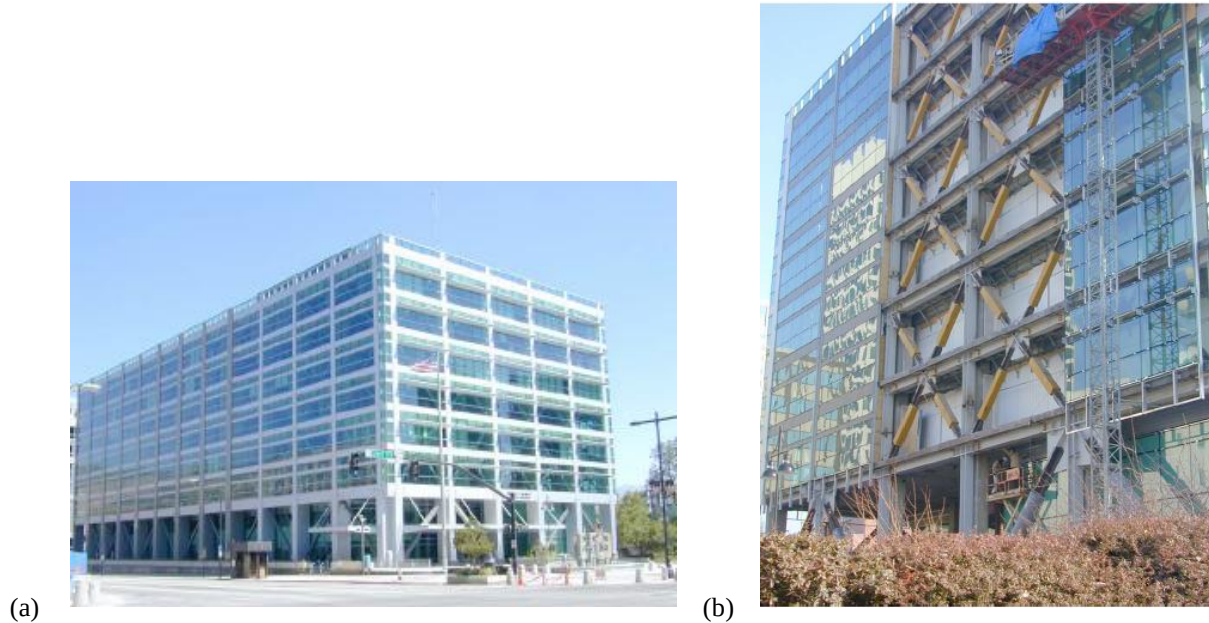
(a) The Wallace F. Bennett building and (b) the building without glazing, showing the buckling restrained bracing.
